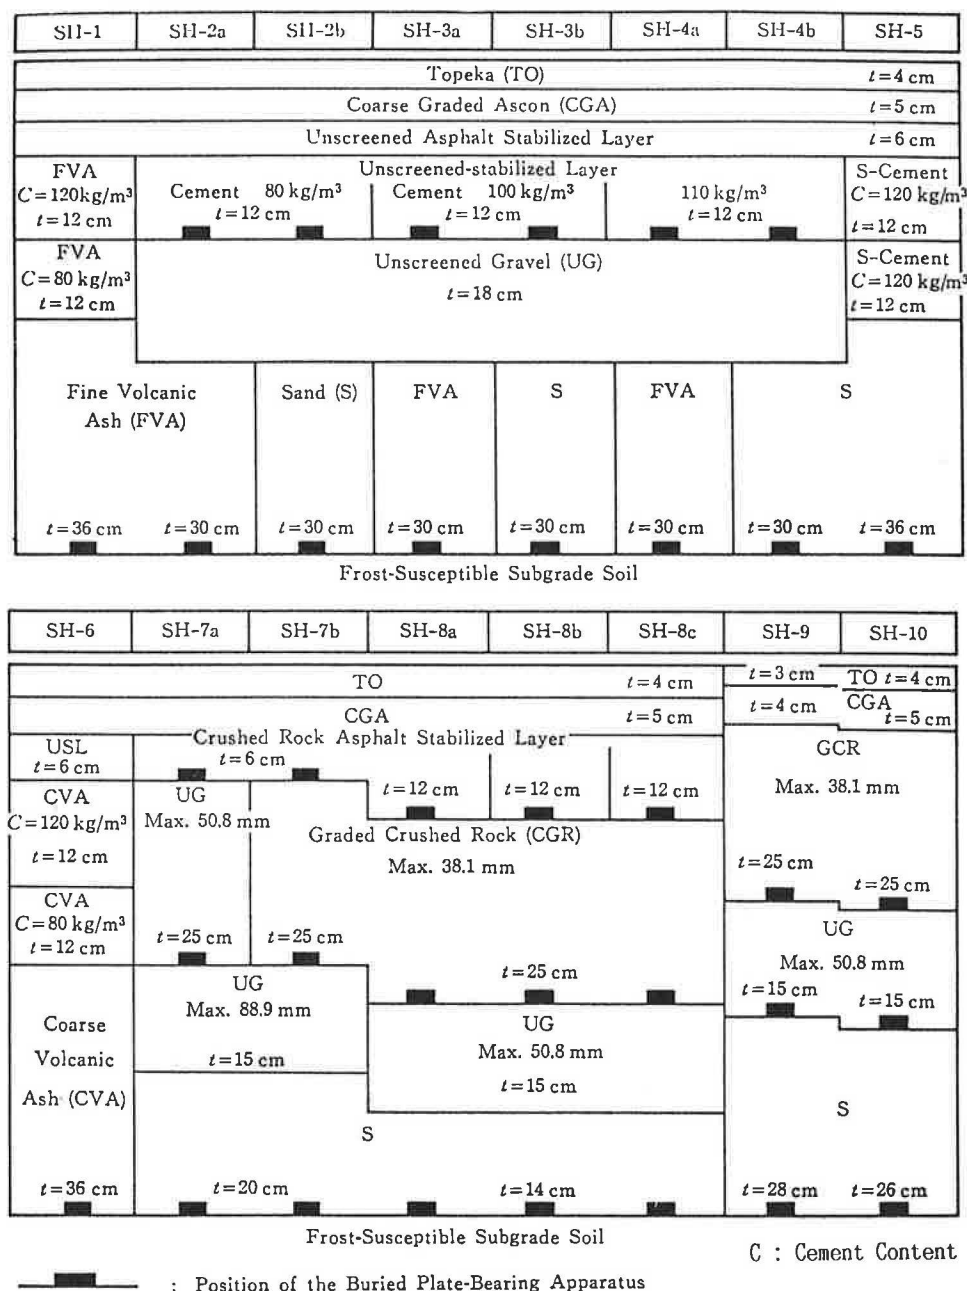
Schematic pavement sections at Bibi Test Road.
